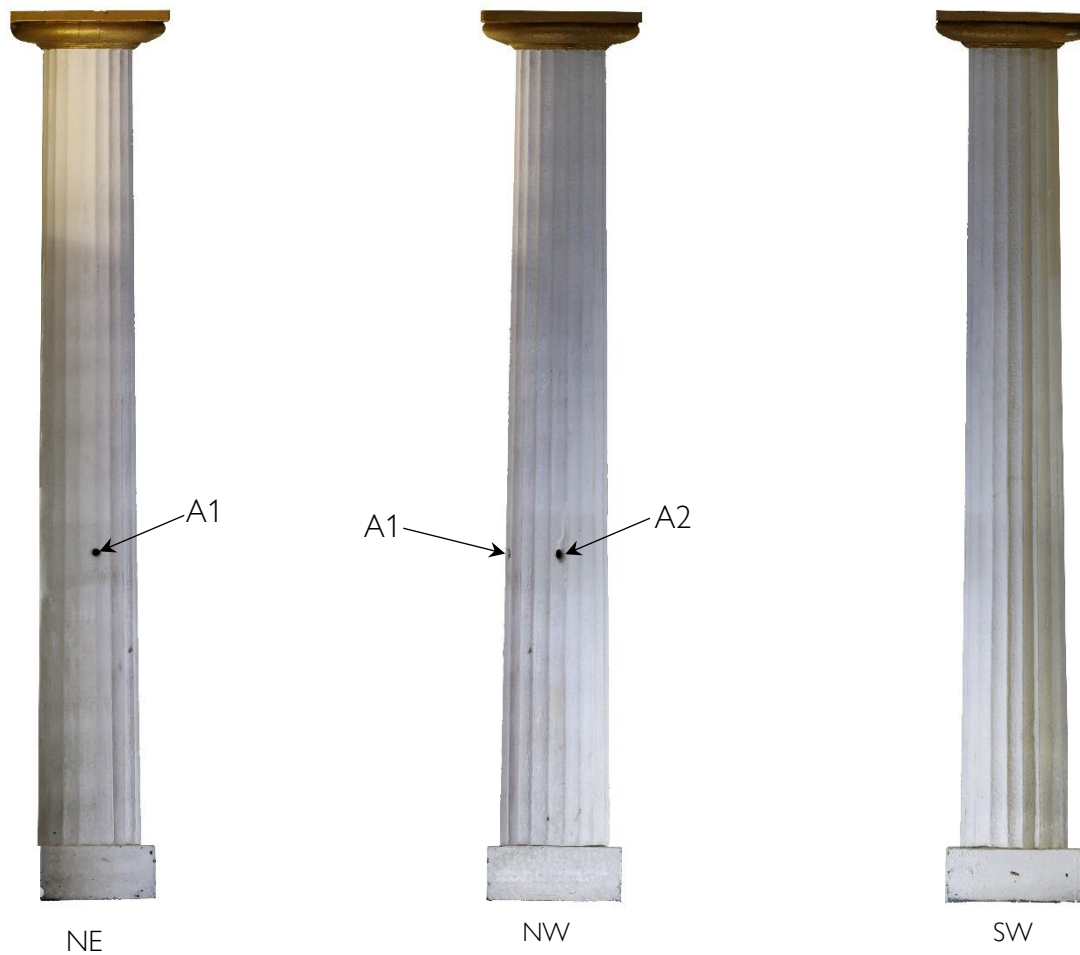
Columns viewed on entry: Column 1 (left) – Column 2 (right).
